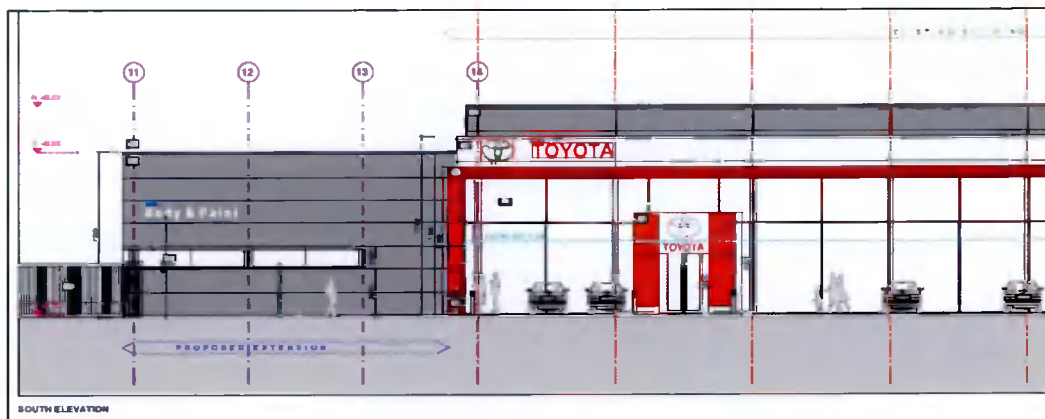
Extract from Node's 'Proposed Elevations (1)' Dwg. No. Pa_3-03 showing height of the proposed extension in comparison to the existing building.
